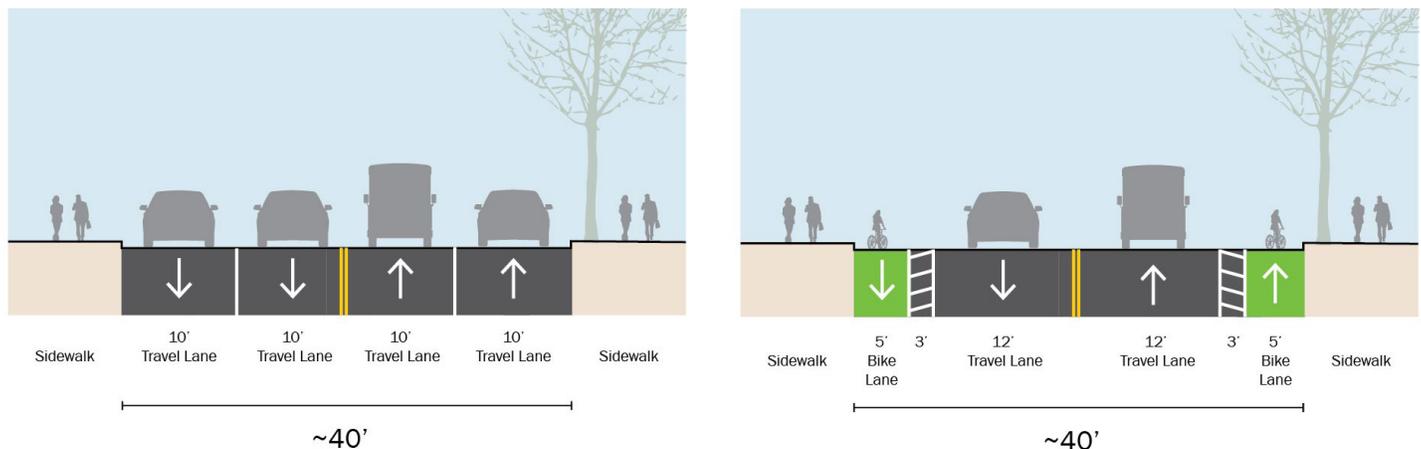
Existing and Recommended Cross Section of Raymond Boulevard between University Avenue and Market Street (looking west)
